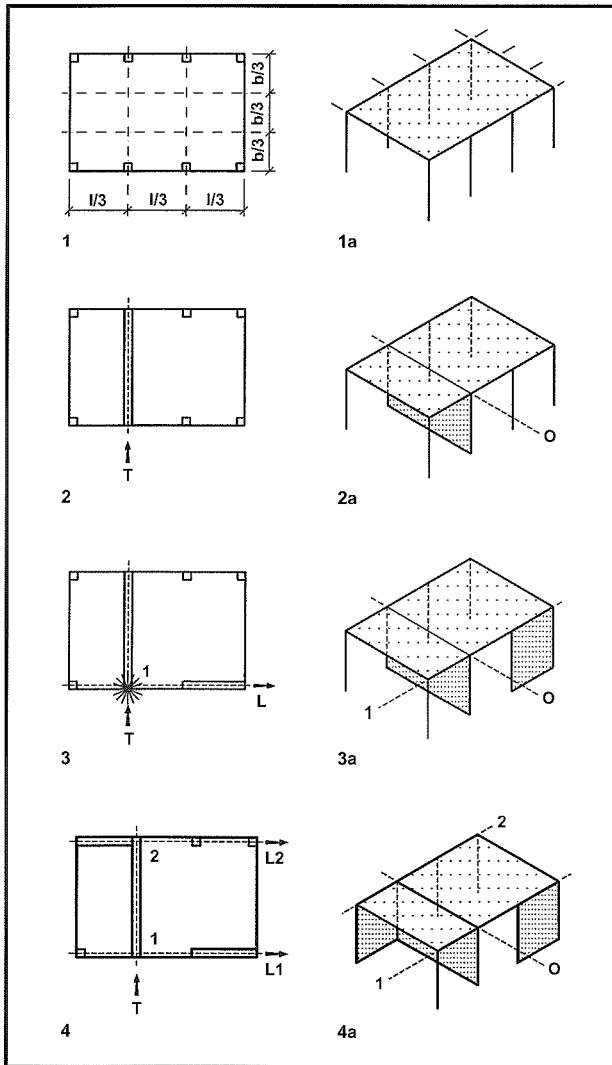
Stability Of Statically Determinate Slab-Wall System
